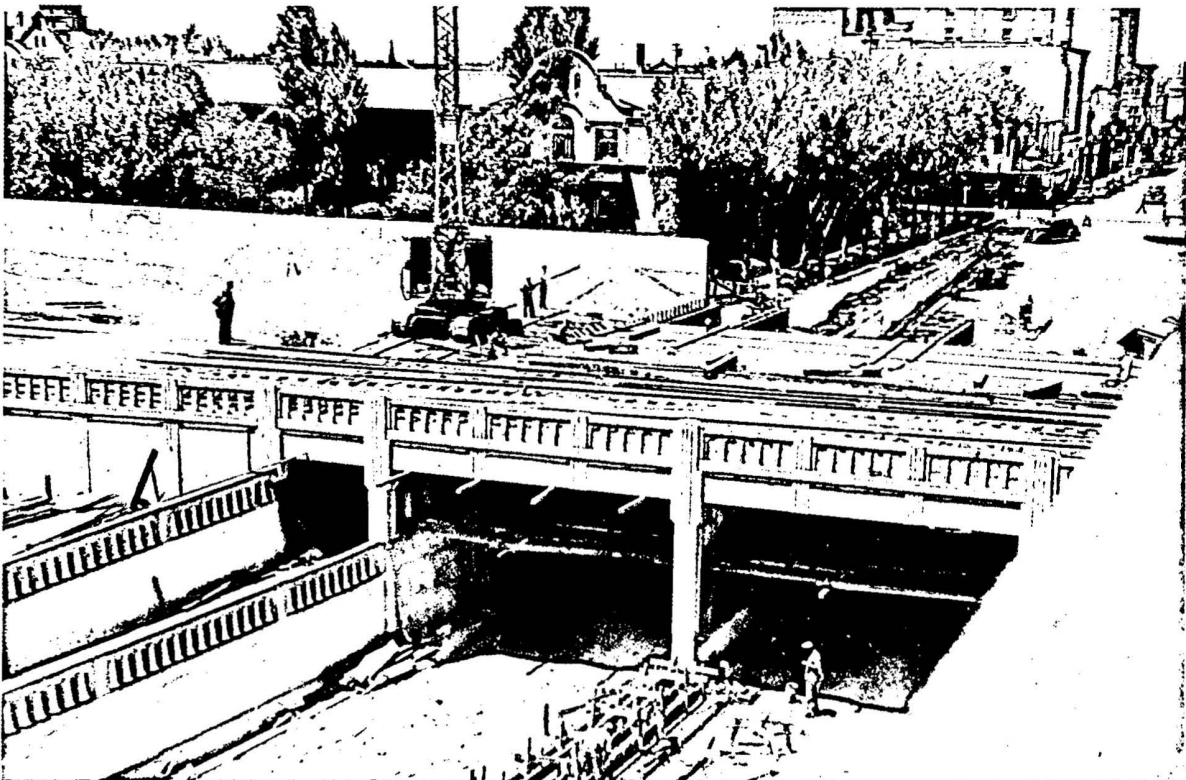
Central Avenue Underpass (No. 3116) During Construction in 1937. The Alvarado Hotel and Downtown Albuquerque are shown in the background. (Highway Department Bridge Files)
